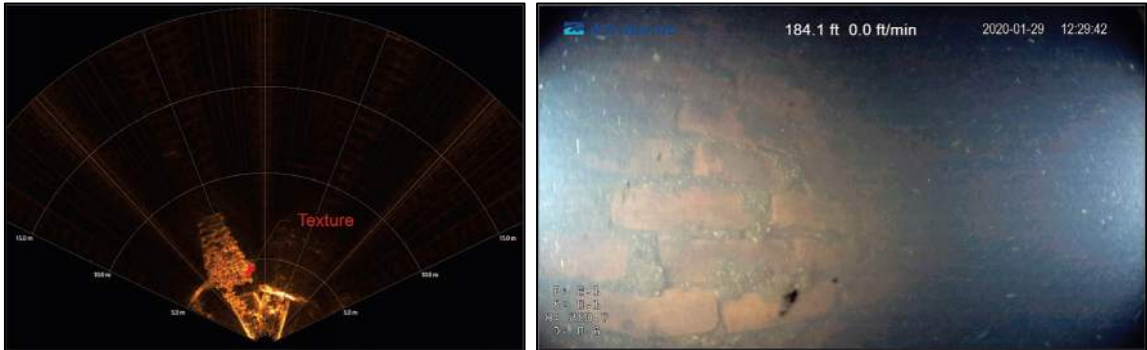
Sonar image of outfall at 175 feet (left); Image of brick construction at 184 feet (right)
